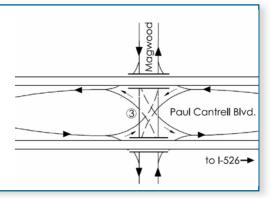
Paul Cantrell Boulevard at Magwood Drive Alternative 5
